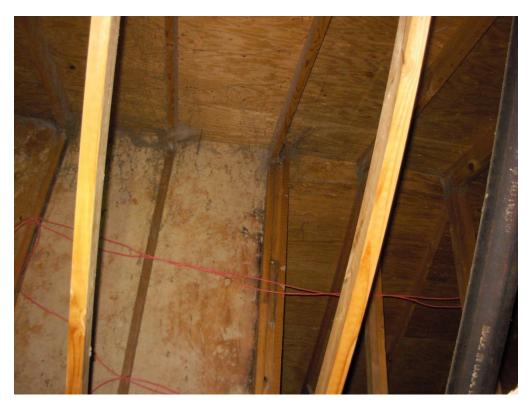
The end and front entry clerestory walls are built into the truss profiles.
